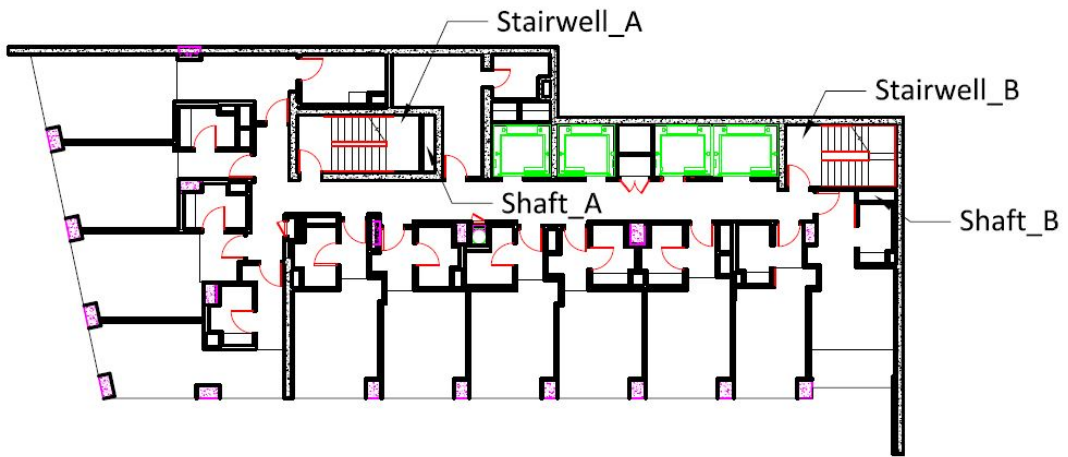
3rd through 5th floor layout has 12 bedrooms and 12 bathrooms
